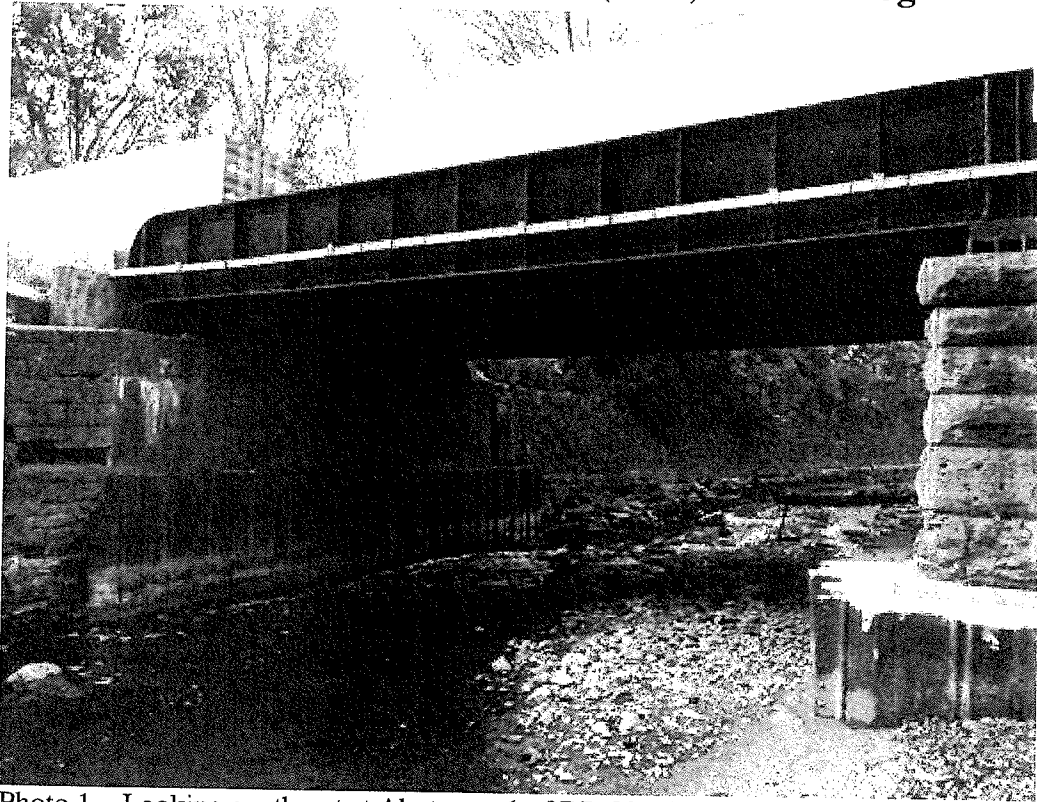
Looking southeast at Abutment 1 of BR 88.74.
